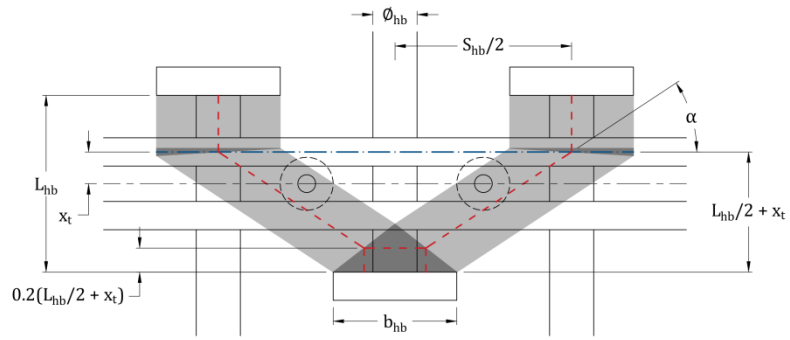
Tensile force transfer within headed bar joint (plan)
